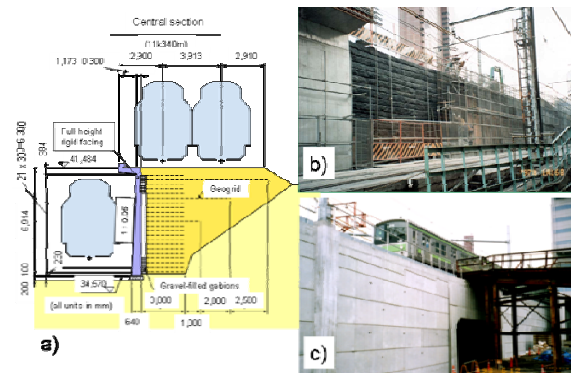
GRS RW having a FHR facing for Yamanote Line (one of the busiest urban railways in Japan) flying over Chuo Line (another busiest urban railway) constructed during 1995–2000 next to Shinjuku station, Tokyo: a) typical cross-section; b) wall under construction; and c) completed wall.
